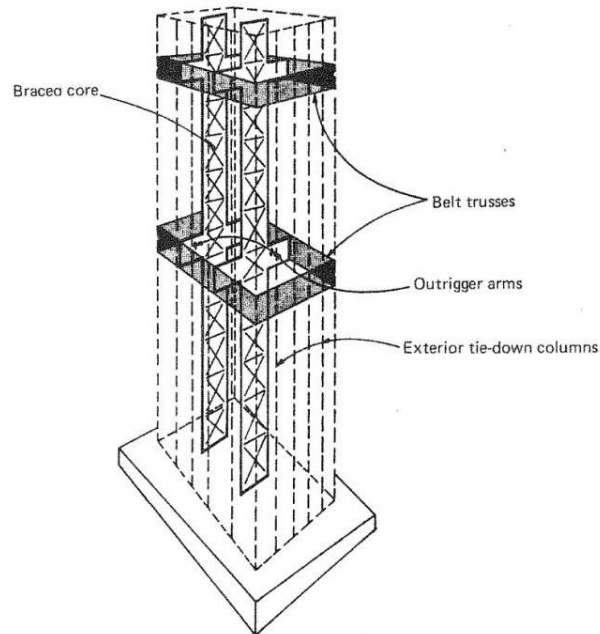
Scheme of belt trusses working in connection with the outrigger system.
